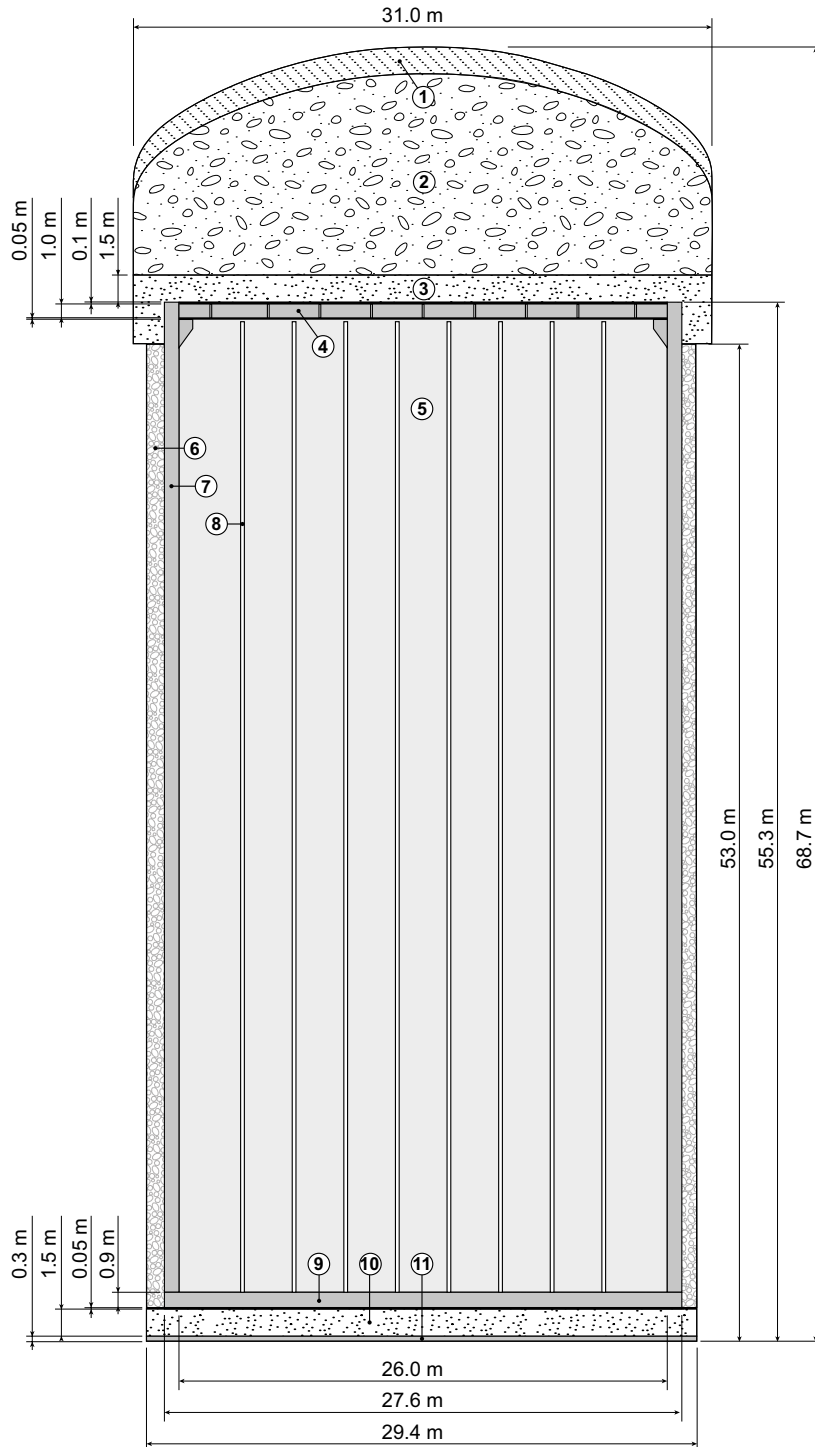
Schematic vertical cross-section of the silo at closure. The waste packages are surrounded by grout in this waste vault. Key to numbering 1) Cement-stabilised sand 2) Crushed rock backfill 3) Compacted fill with a mixture of 10 % bentonite and 90 % sand 4) Reinforced concrete slab with sand layer and gas evacuation channels 5) Waste 6) Side bentonite layer 7) Outer concrete wall 8) Inner (shaft) walls of concrete 9) Concrete slab 10) Bottom sand-bentonite layer 11) Bottom drainage system.
